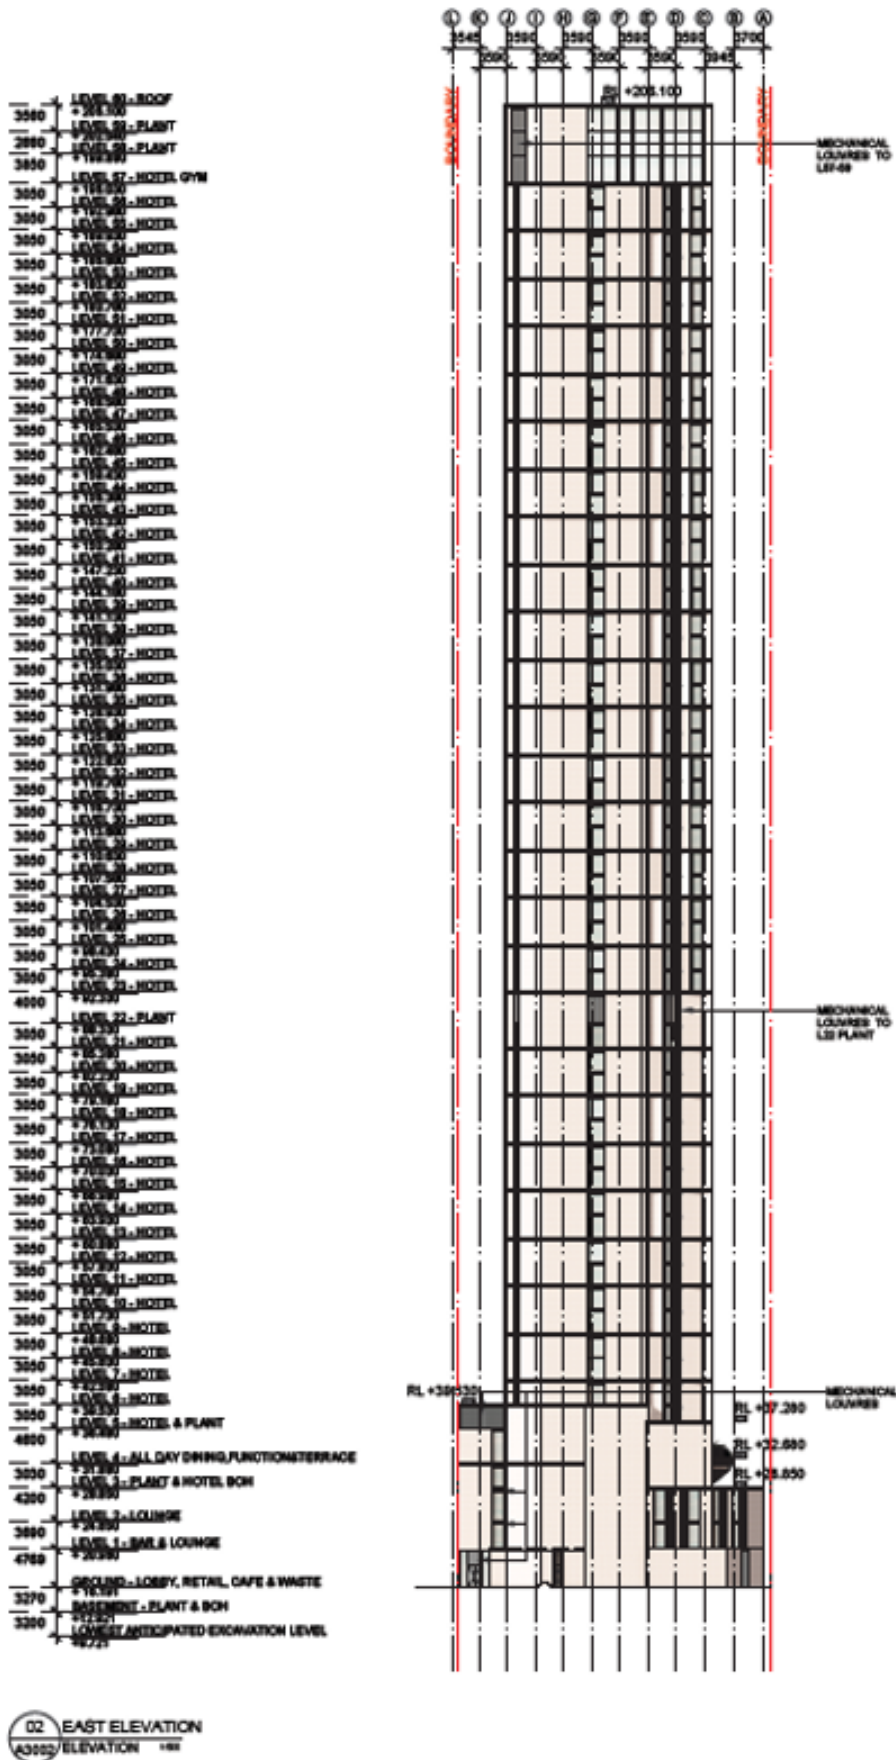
| East (rear) elevation of tower (Source: RtS architectural plans)
